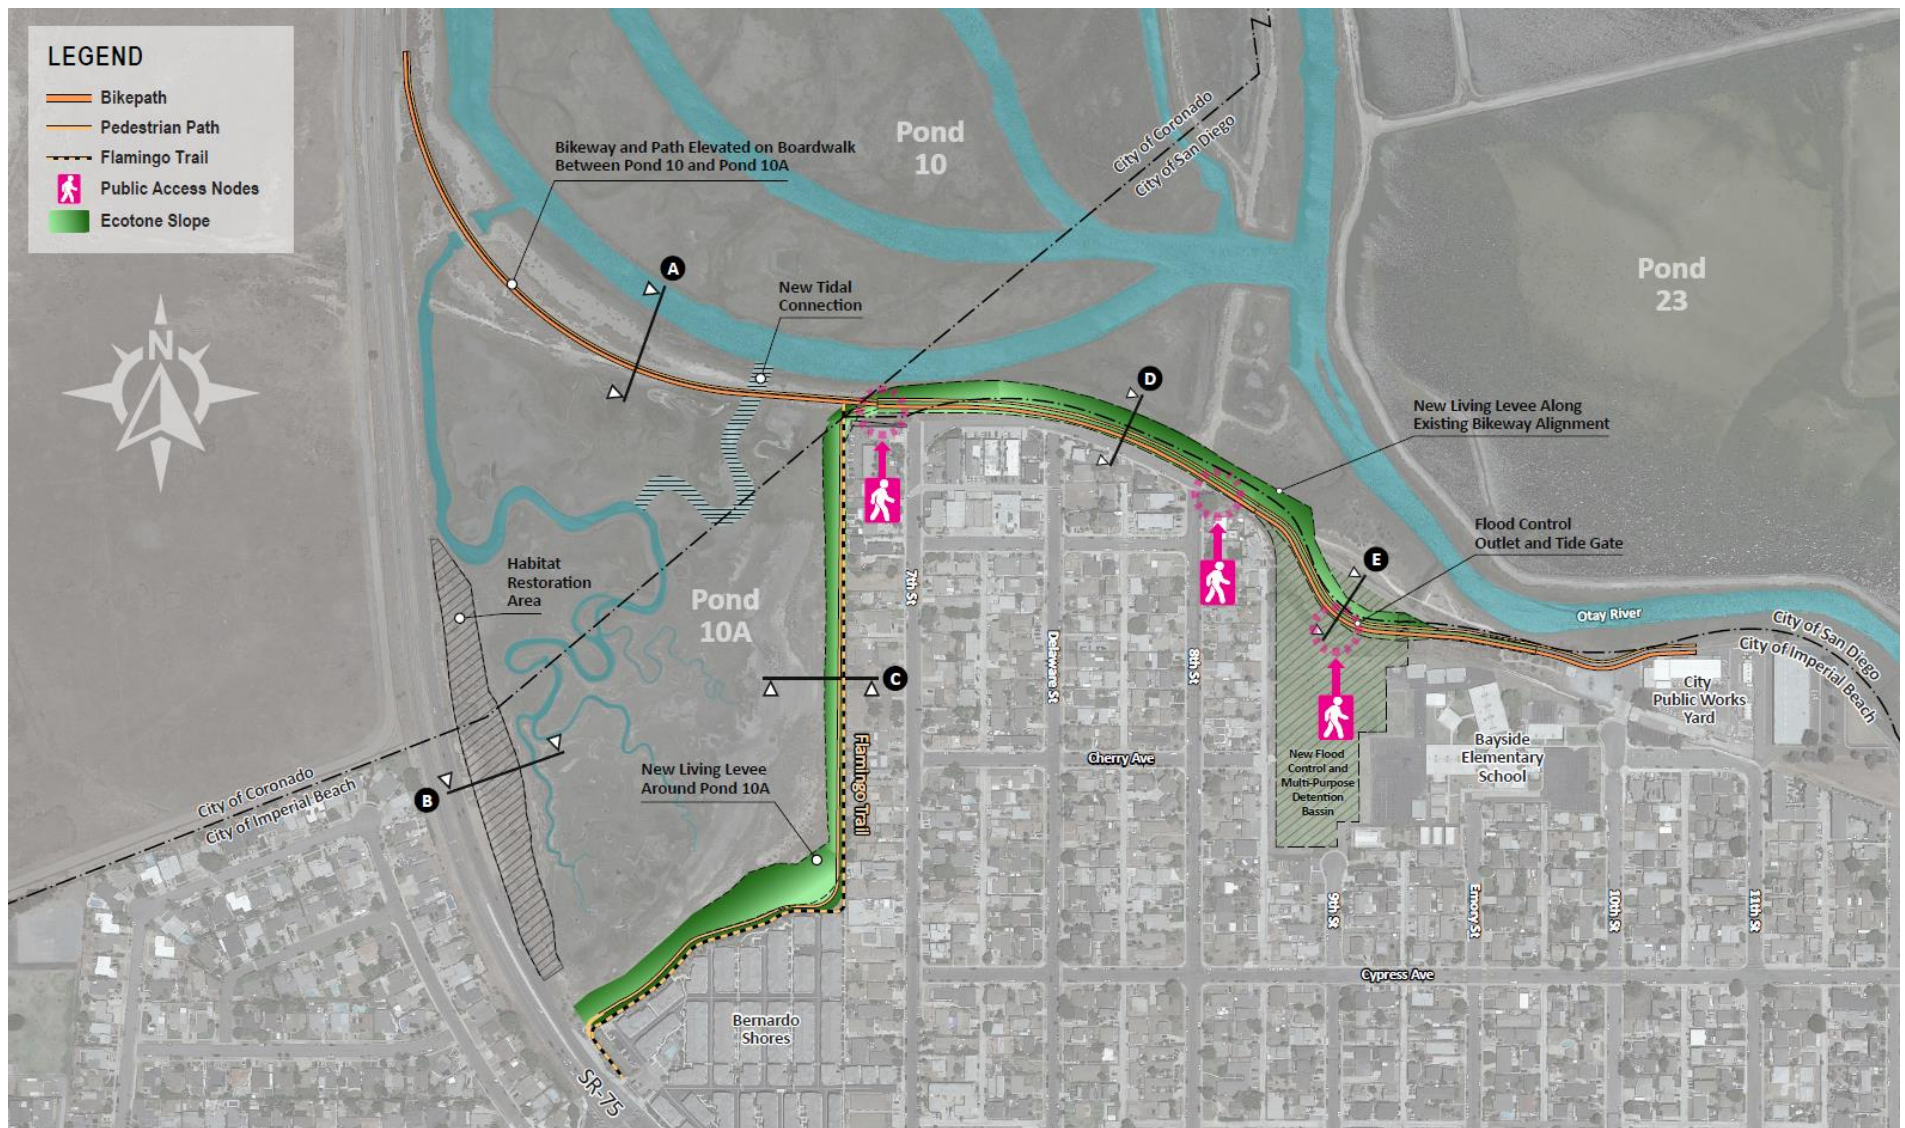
Alternative 2 – “Replace with Bridge” Plan View
